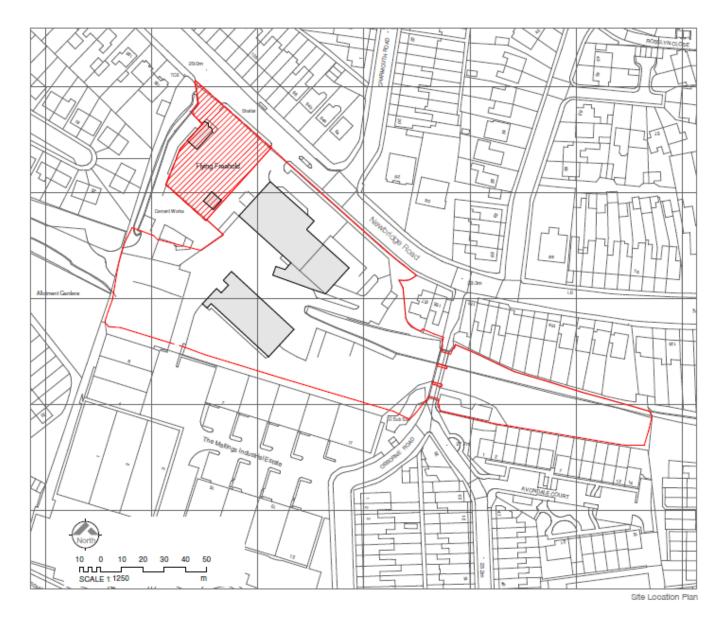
Existing site plan. The red line boundary shows the extent of the site.
